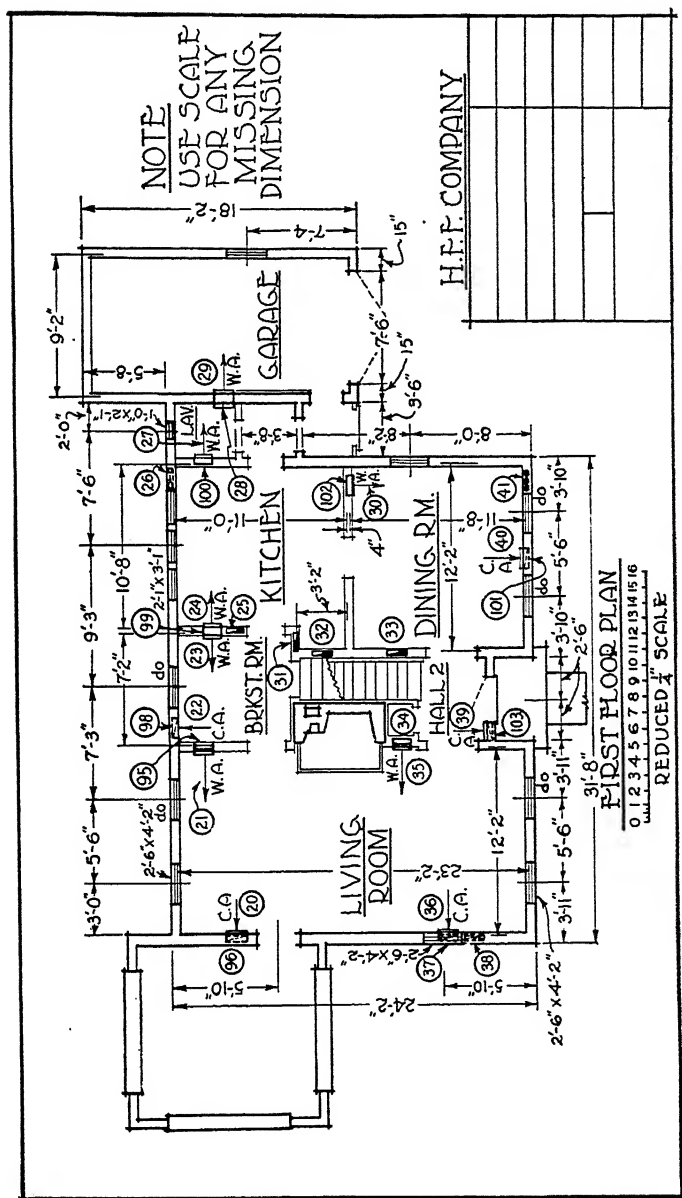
First Floor Plan Showing Warm- and Cold-Air Registers
